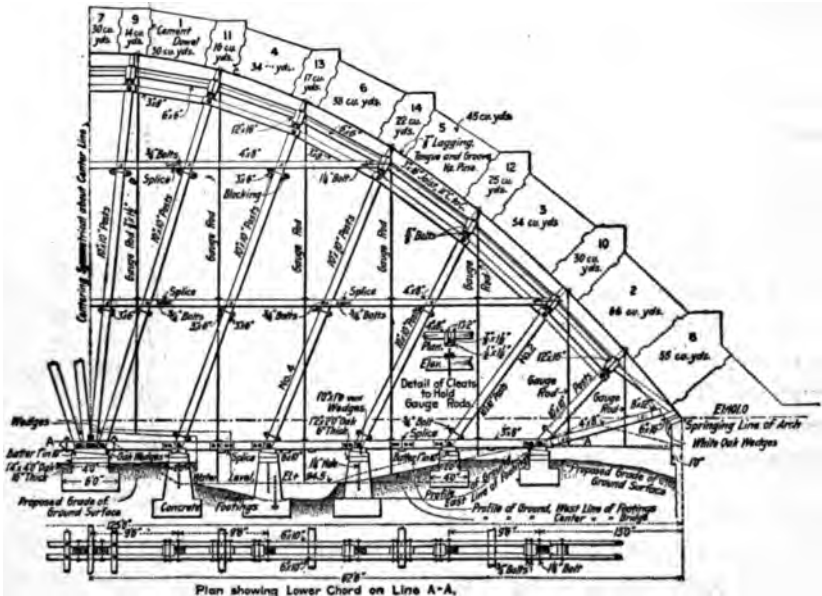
Side Elevation of Center for Piney Creek Bridge.
